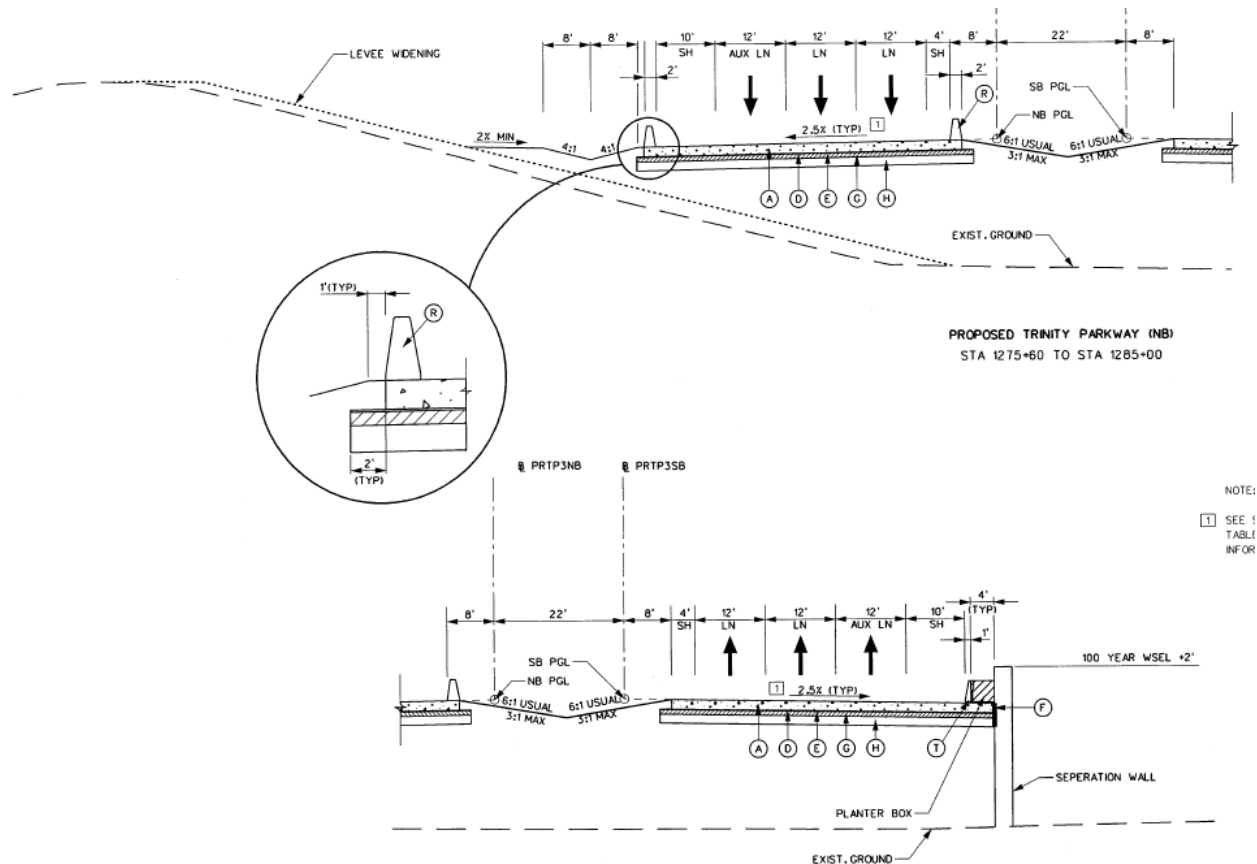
Typical cross-section of a Trinity Parkway roadway embankment.
